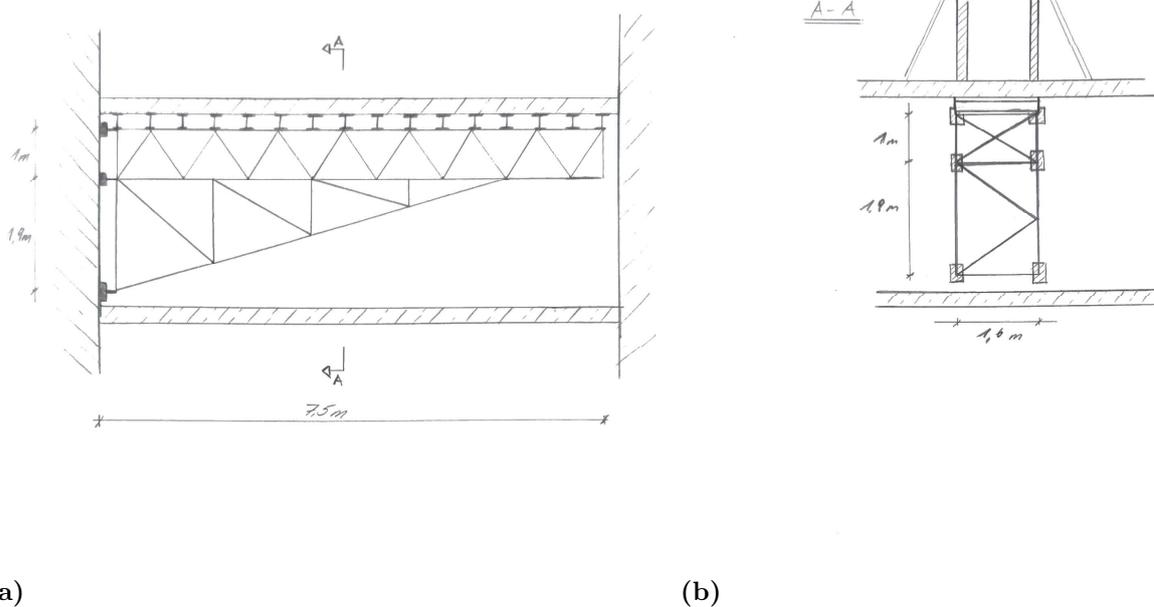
Conceptual sketches of the truss cantilever concept. To the left, the longitudinal section of the cantilever is shown. To the right, the section A-A can be seen.
